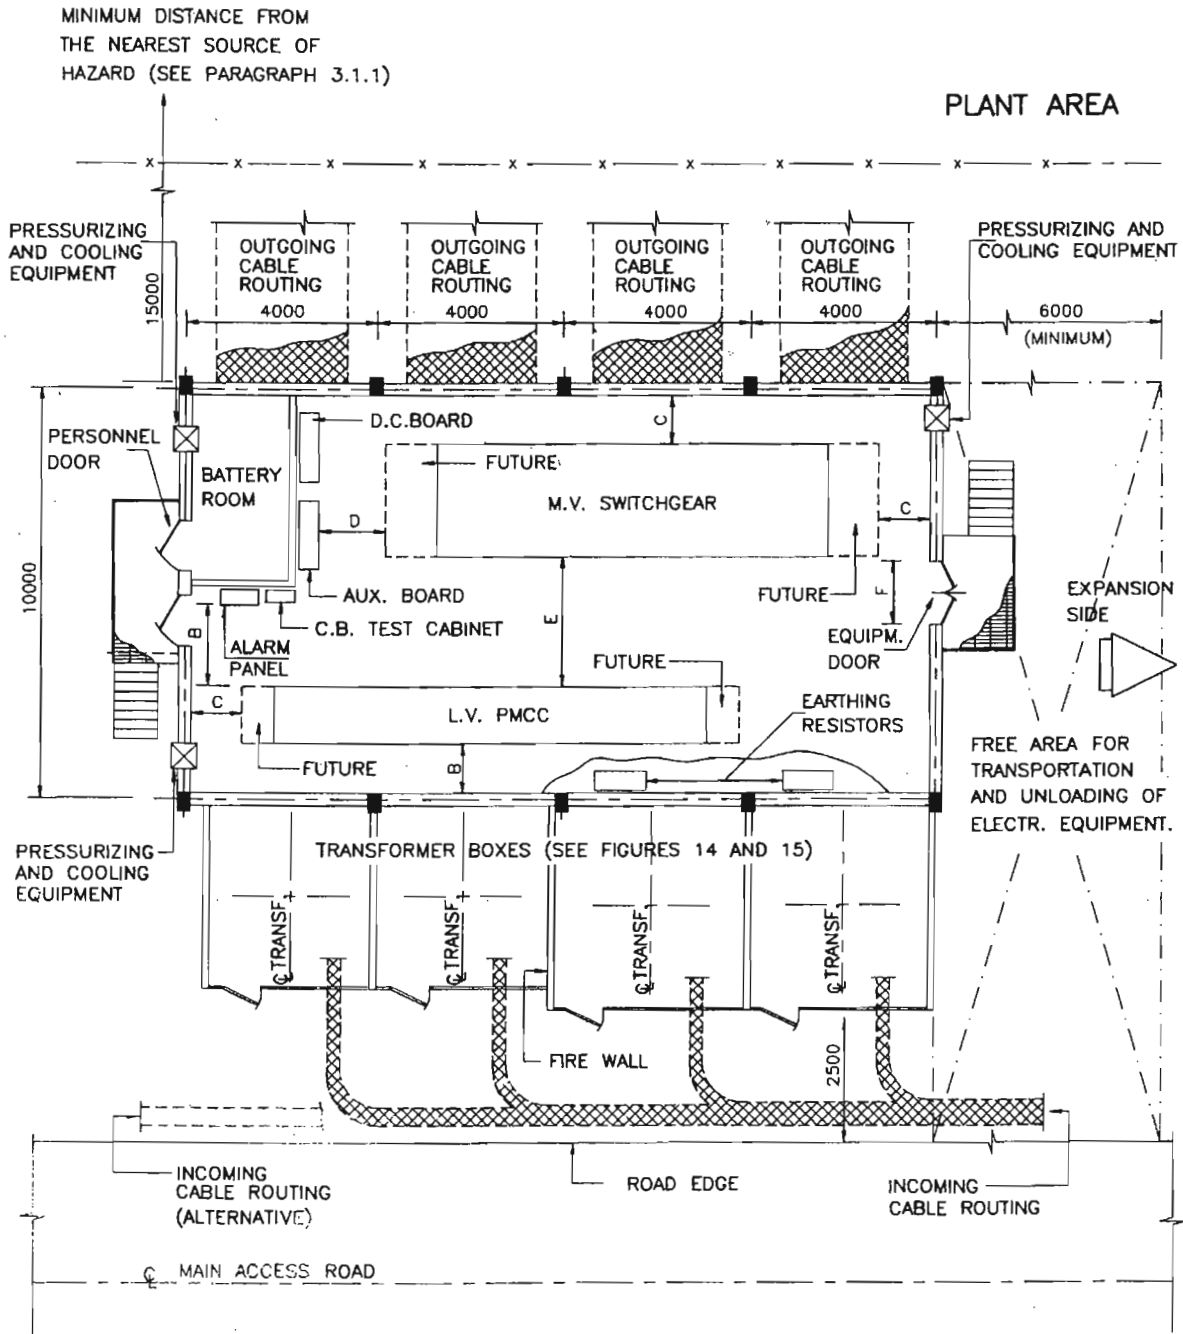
LAYOUT–L.V.& M.V. DOUBLE ENDED SUBSTATION
